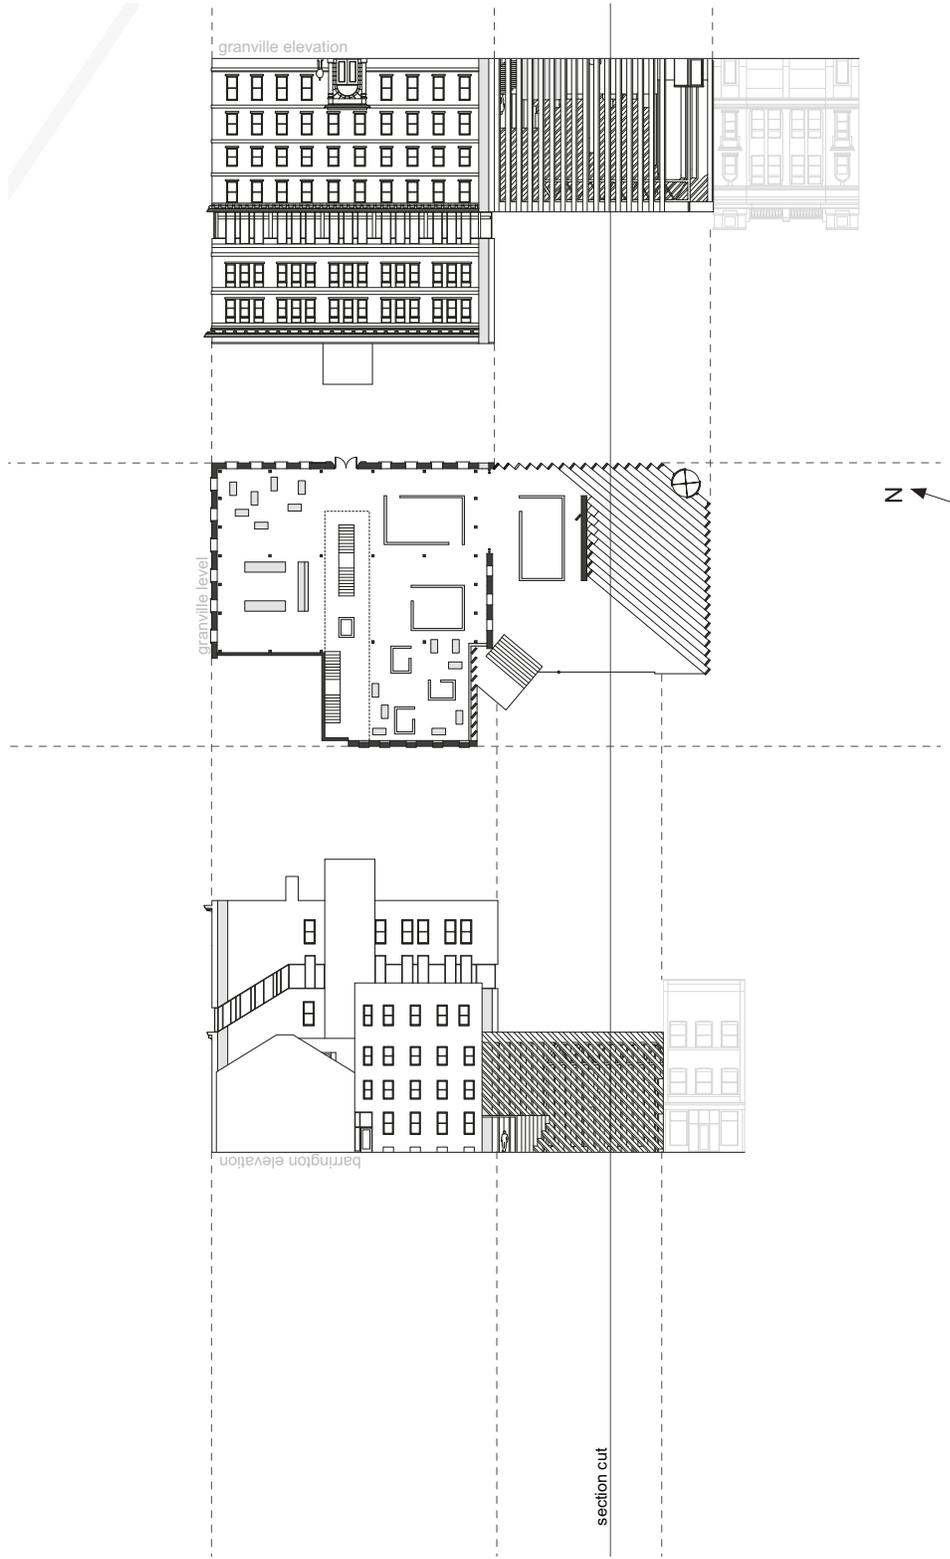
The Intervention*, Granville level plan, west and east elevations.
